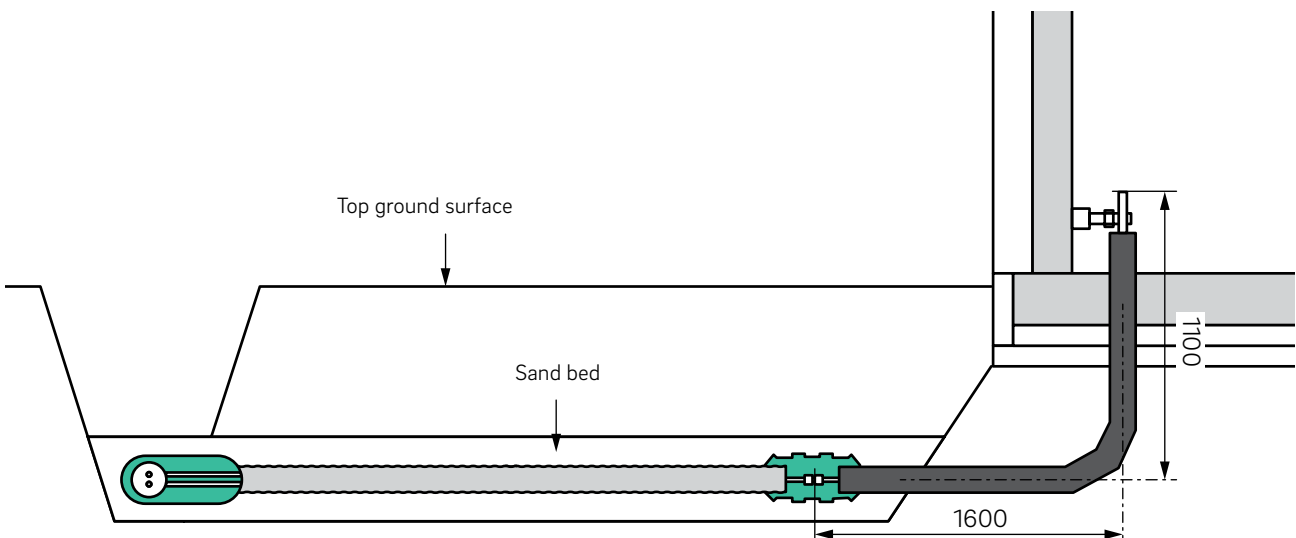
Dimensions of prefabricated lead-in bend (rigid)
